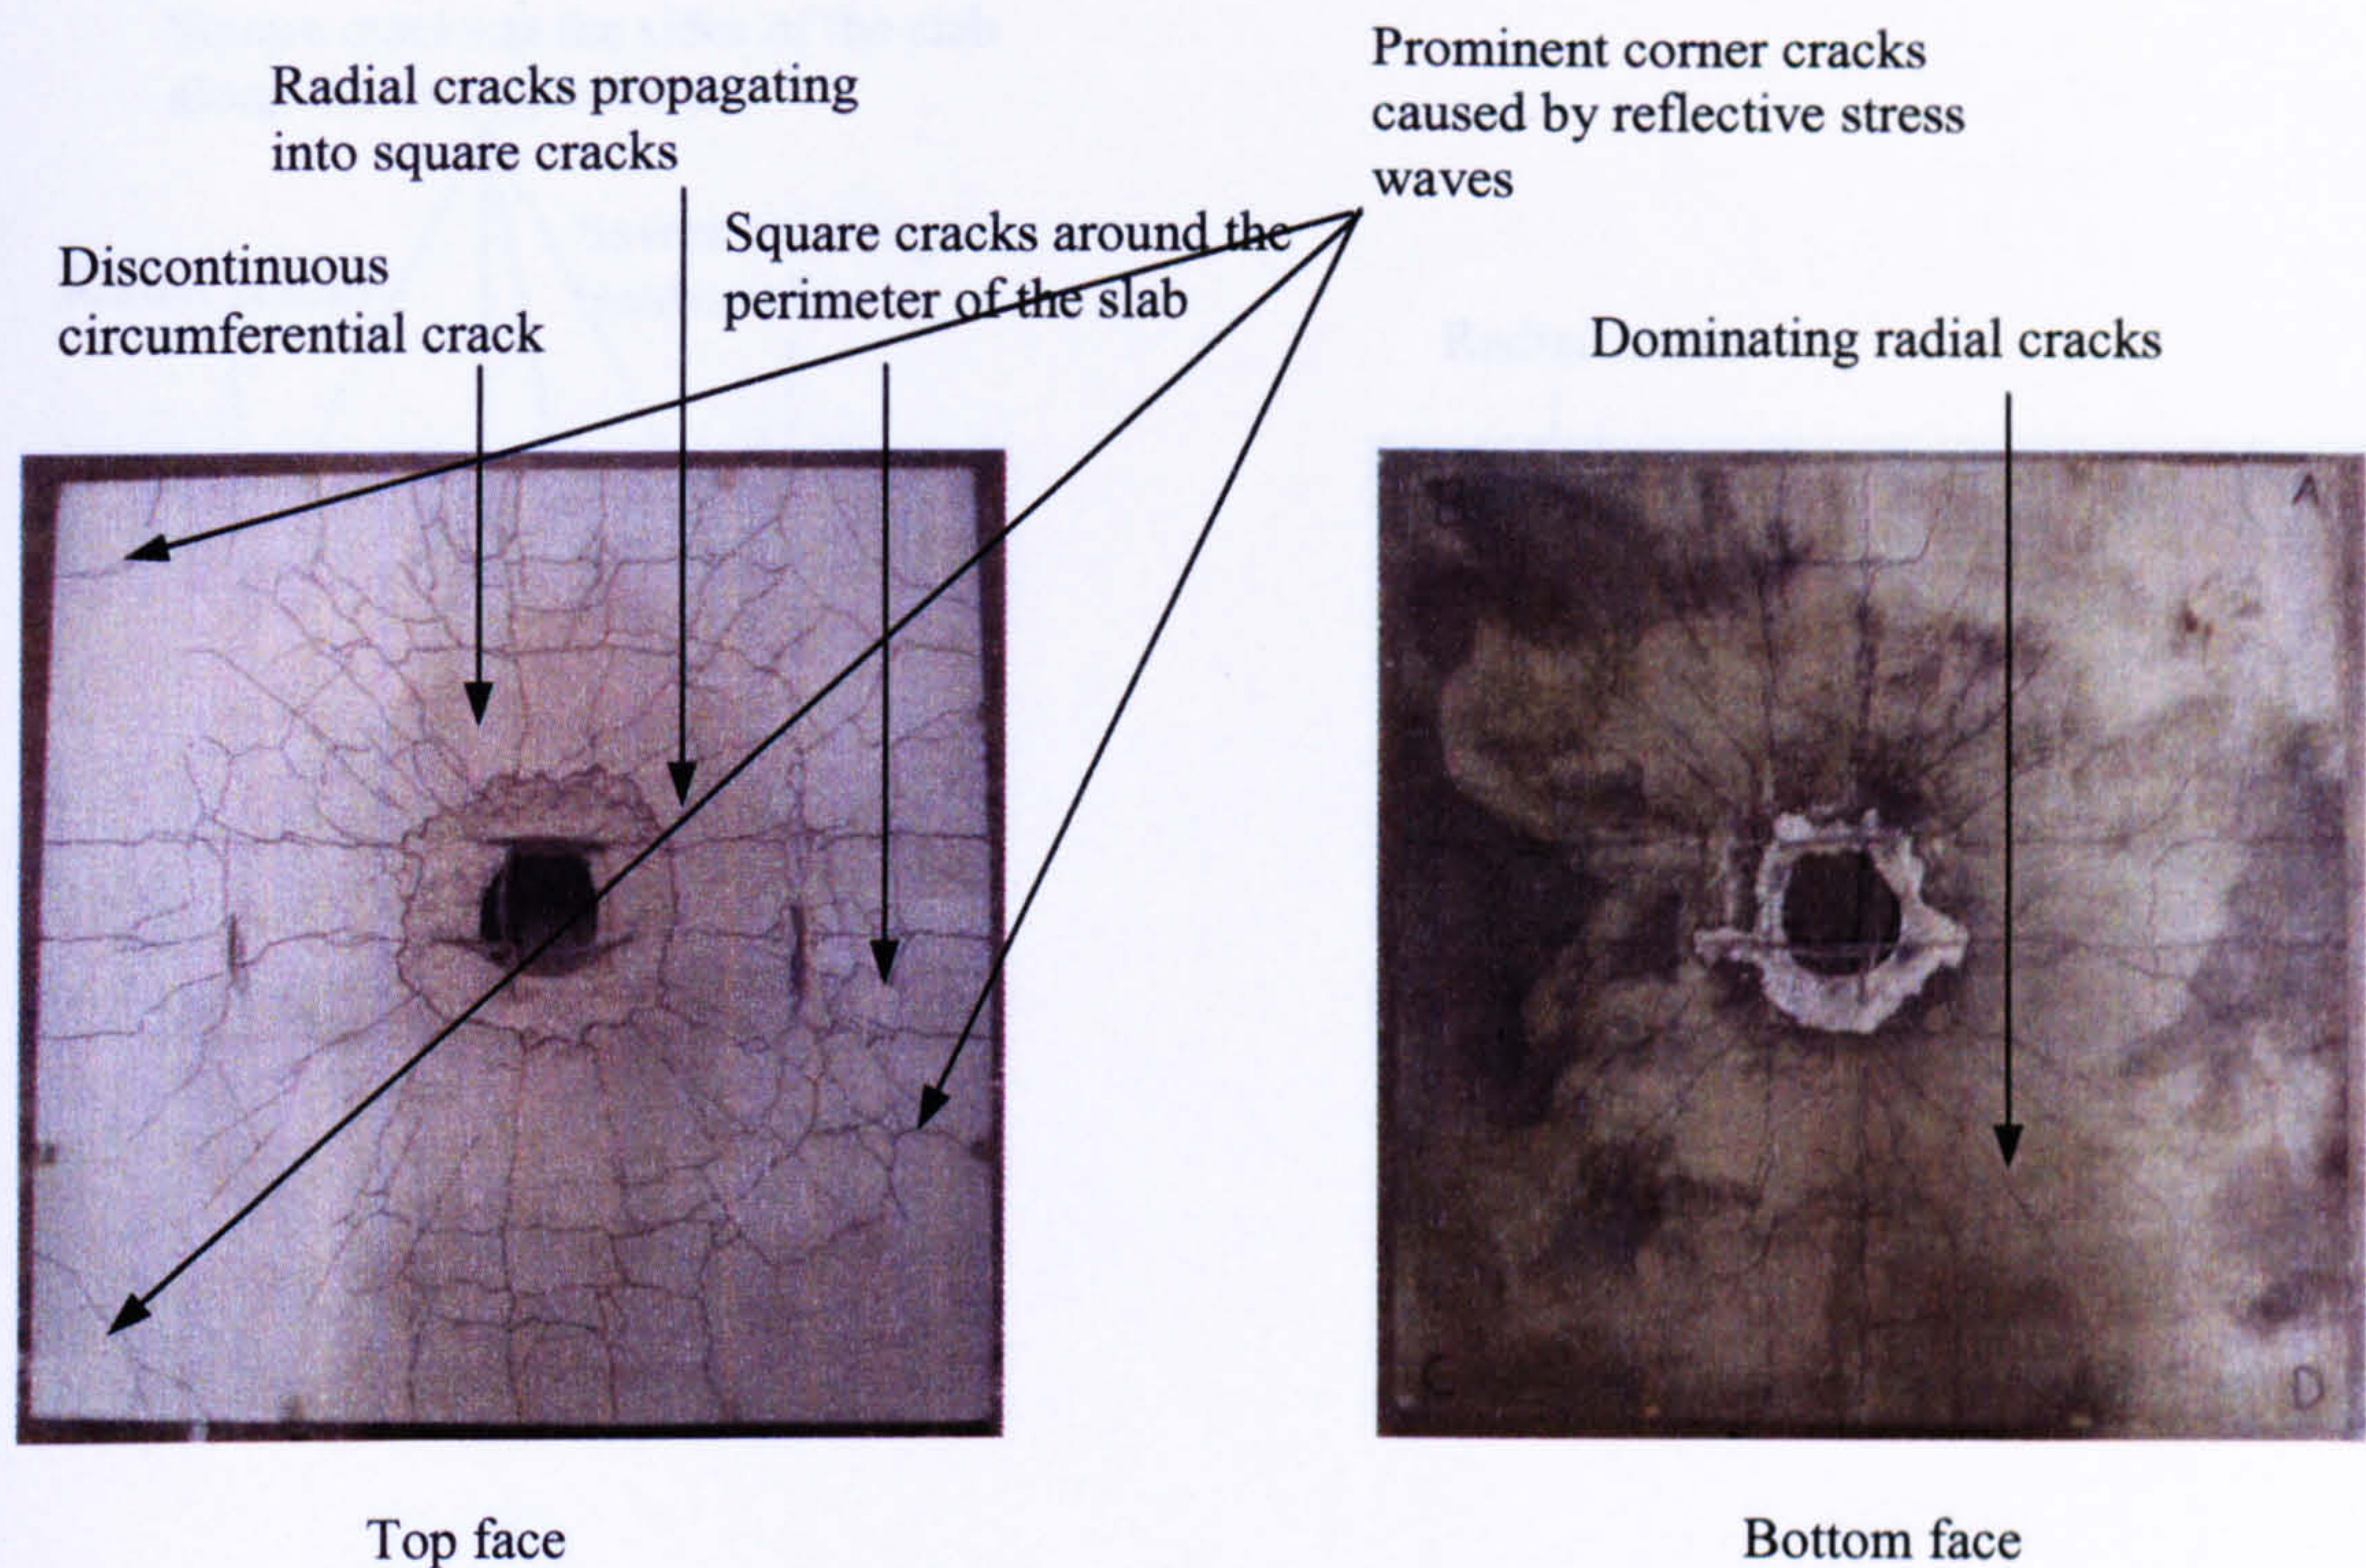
Top and bottom faces of secondary slab RCB73IT15
